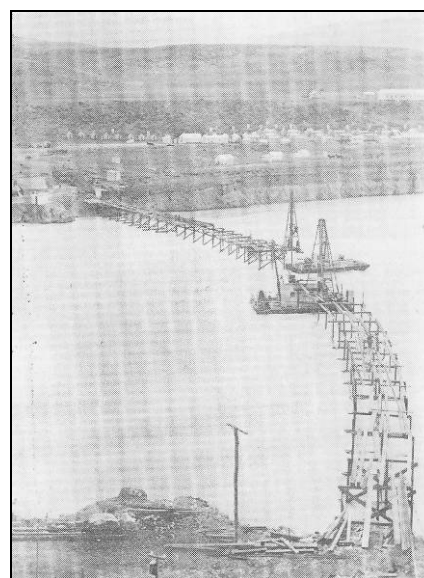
First trestle bridge cDec 1928. Damaged by a flood in Jan 1929
